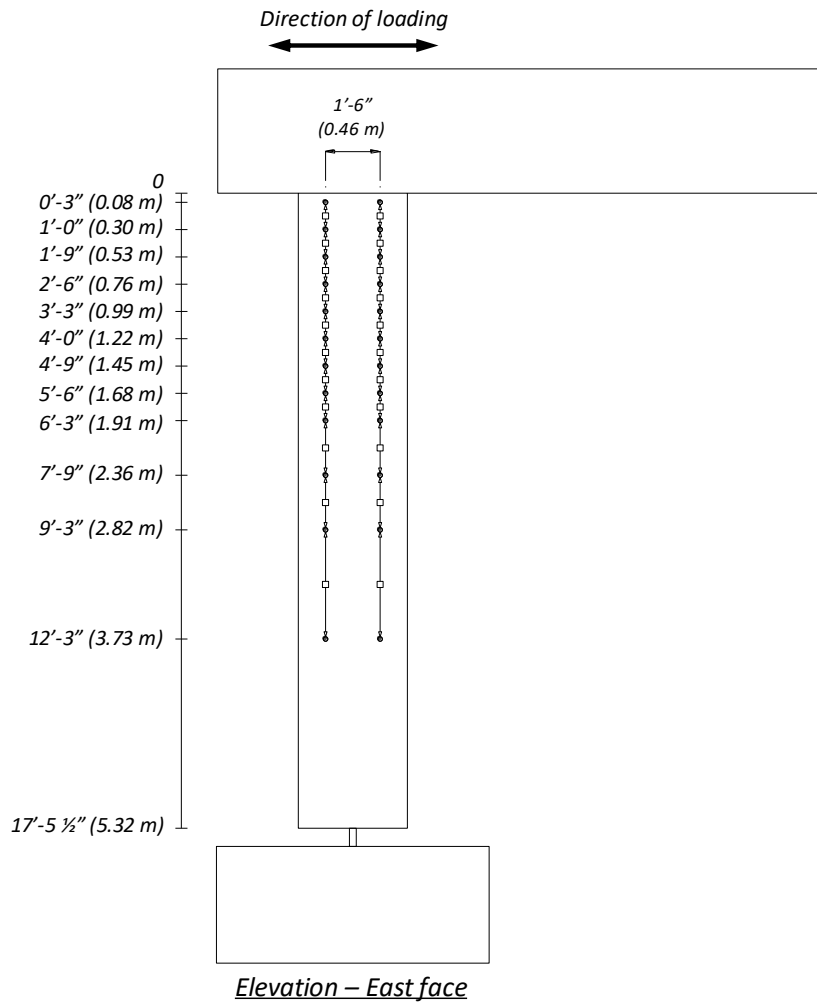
Linear Potentiometers Mounted Along Height of Test Specimen
